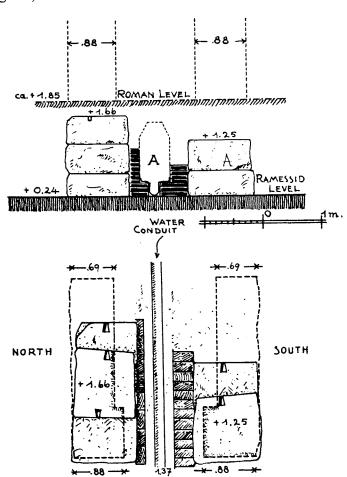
Conduit A between the Foundation Walls of the Gate of Domitian
